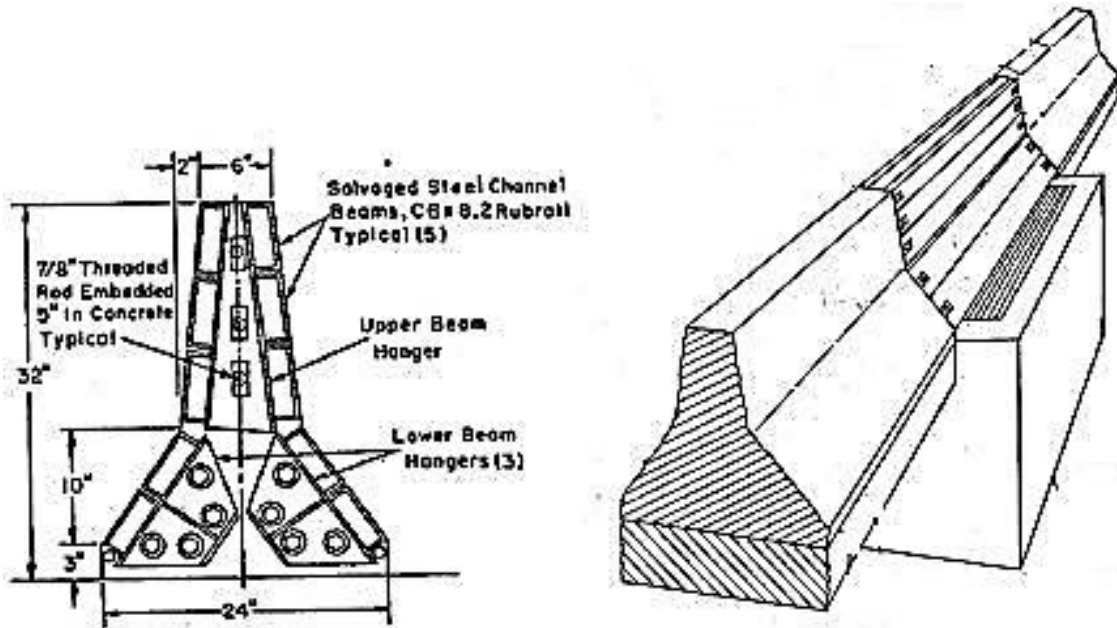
Hanger Bracket and Steel Channel Beam Design [27]
